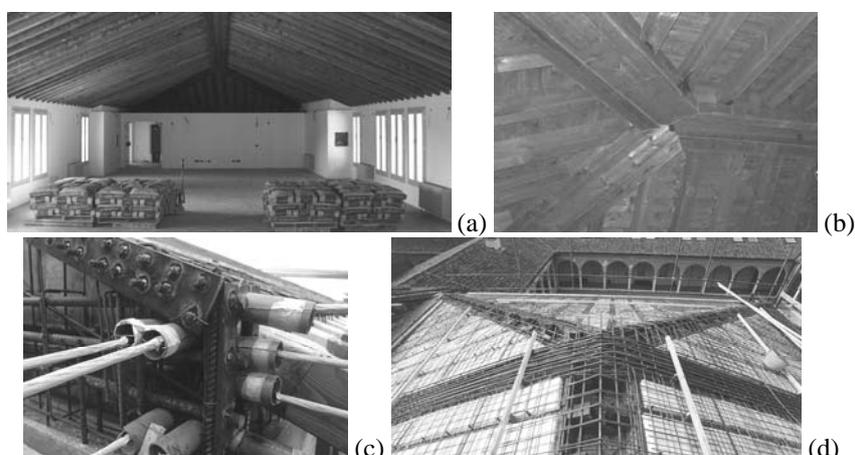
Santa Chiara Building: (a,b) internal views of the roof structure; (c) detail of the ordinary rebar of the eaves chords and head of the prestressed rebar; (d) detail of the hipped end.
